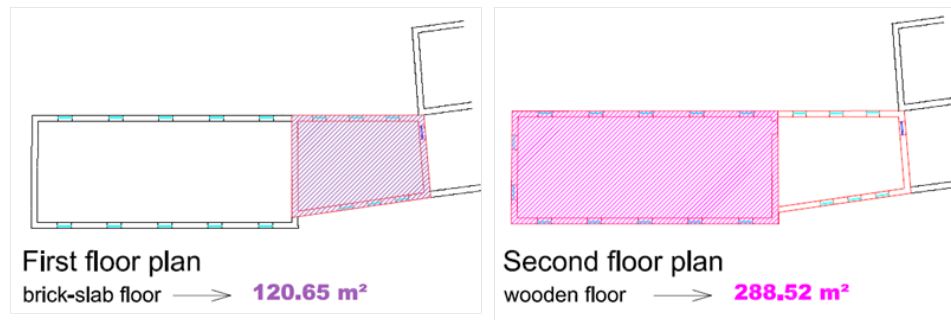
schematic plans of the 1st and 2nd floors
